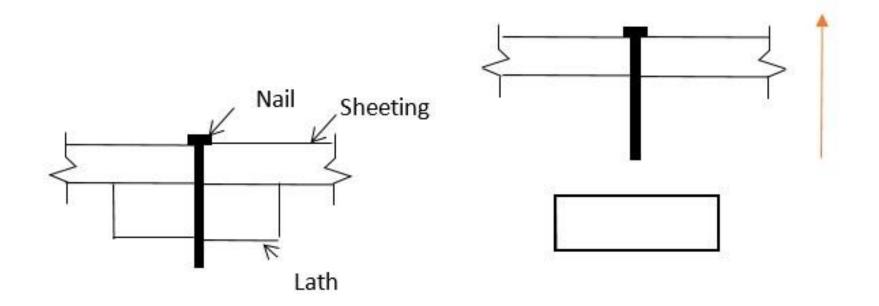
Sheeting-to-Lath Connection Failure Mode: Nail Pullout Cause: Insufficient embedment; proper fastener not used; insufficient number of fasteners or inadequate installation
